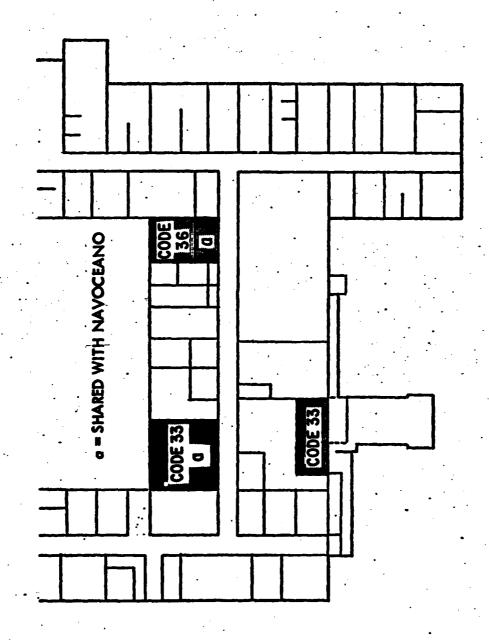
BUILDING 1100, FIRST FLOOR/WEST
